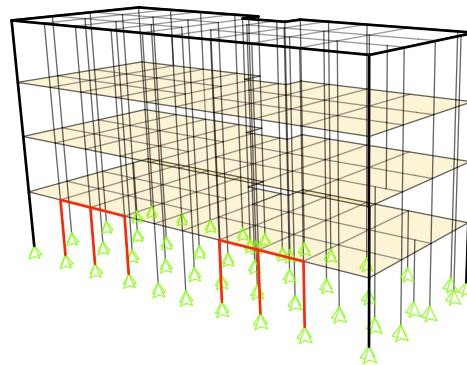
Retrofit 5: Addition of Steel Moment Frames to Garage Front.
